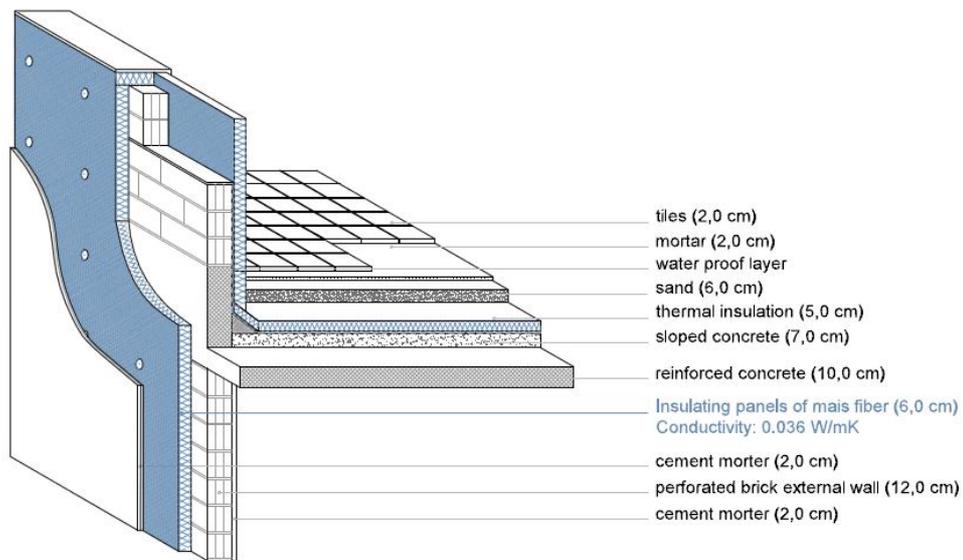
Detail 03 - wall roof connection after intervention from outside
